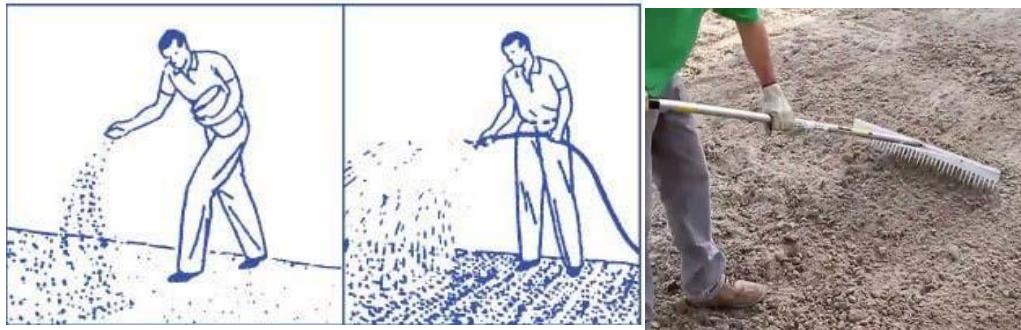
Grass Seeding (Source: Road side Bio-engineering, Site Hand Book, John Howell)
